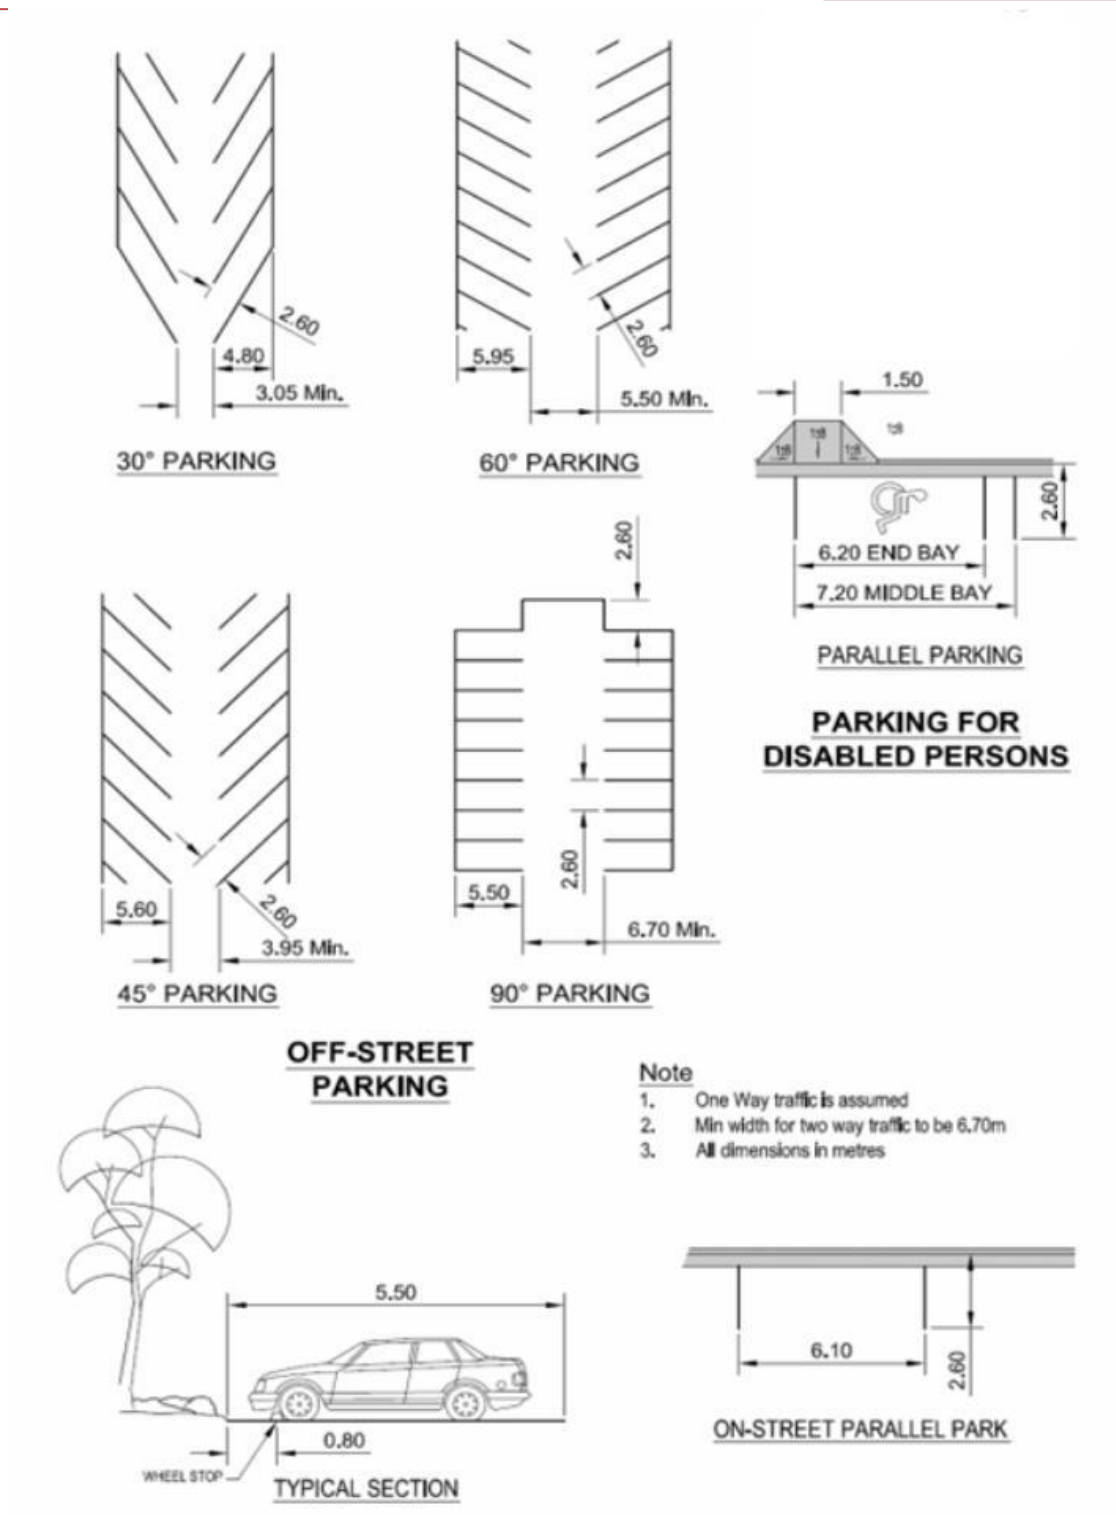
Parking Spaces & Aisles – Recommended Dimensions
